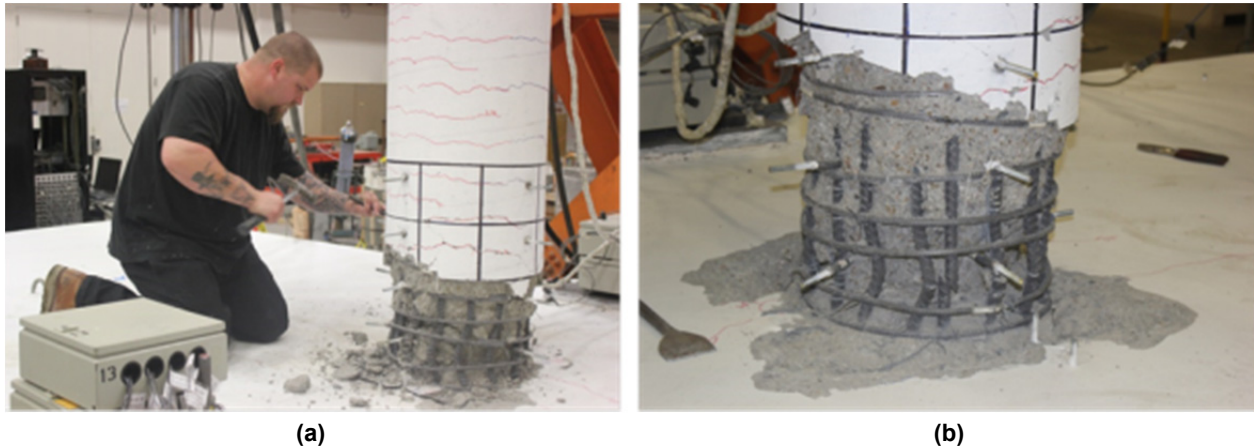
(a) Hammering loose concrete in the plastic hinge zone in the tested specimen; and (b) final damaged state of the tested specimen after removal of all loose chunks of concrete.
